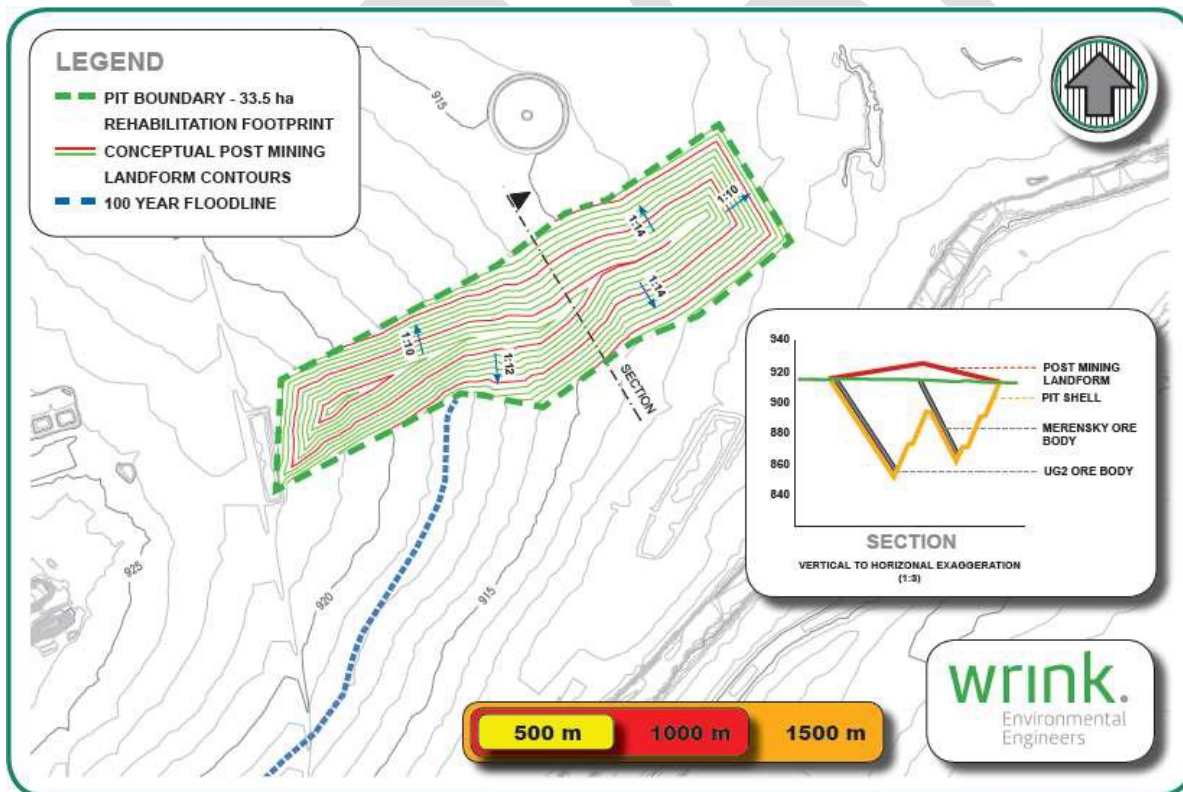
| Final pit arrangement with overburden material returned to the pit (WRINK, 2017).
